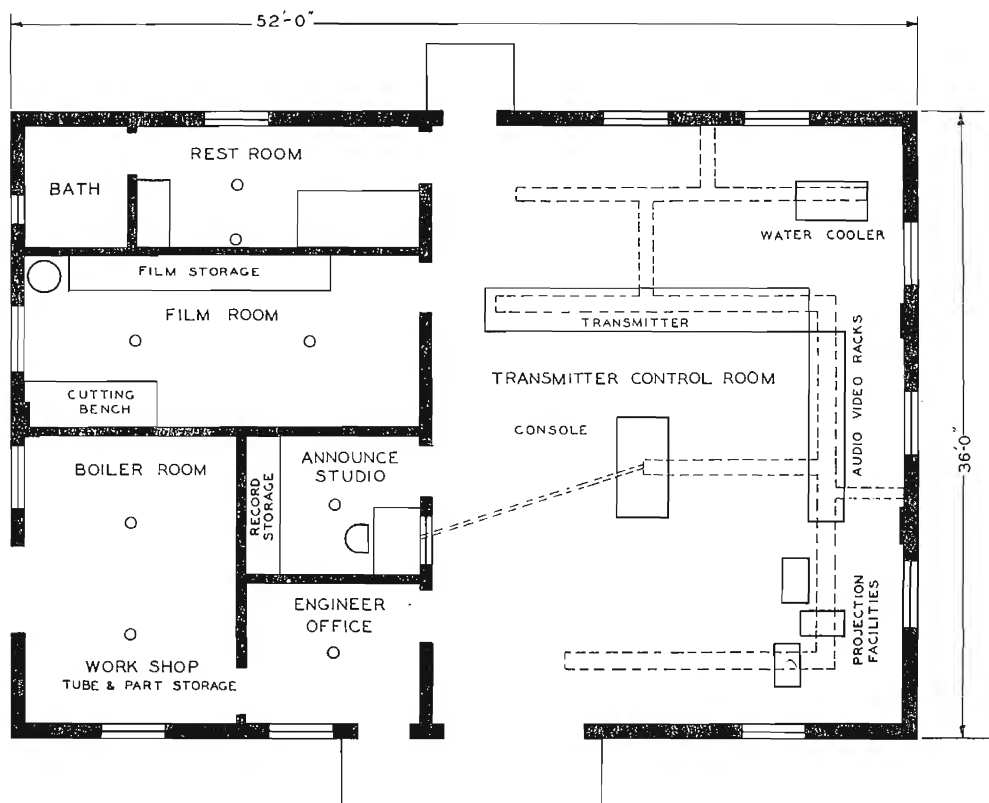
Floor plan showing WKNB-TV's transmitter layout and facilities.
